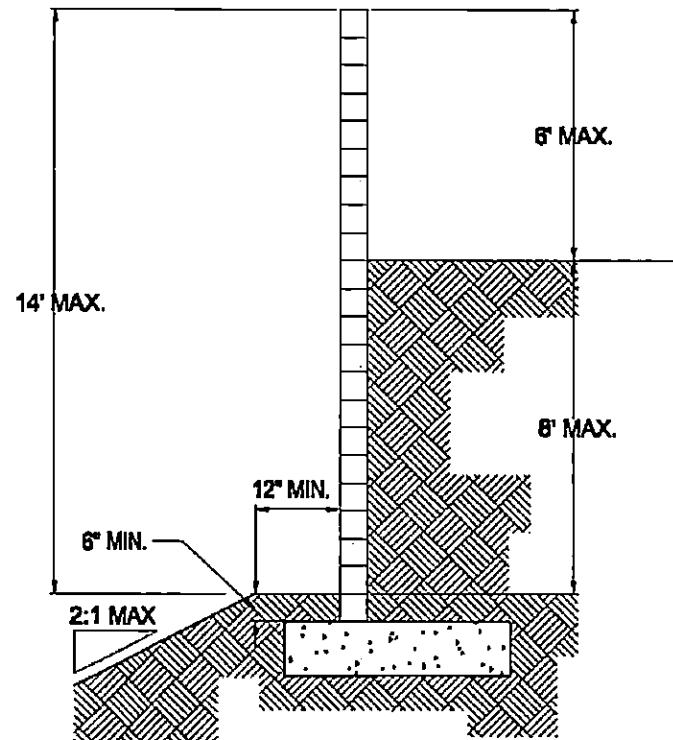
PRODUCT WALLS BETWEEN
